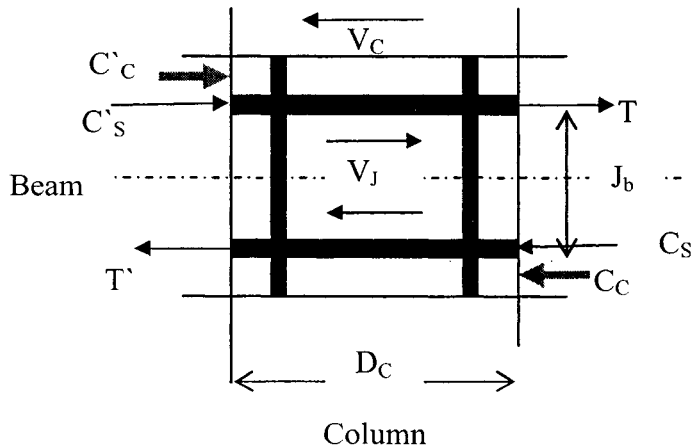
Stresses applied to an internal joint from adjacent beams
